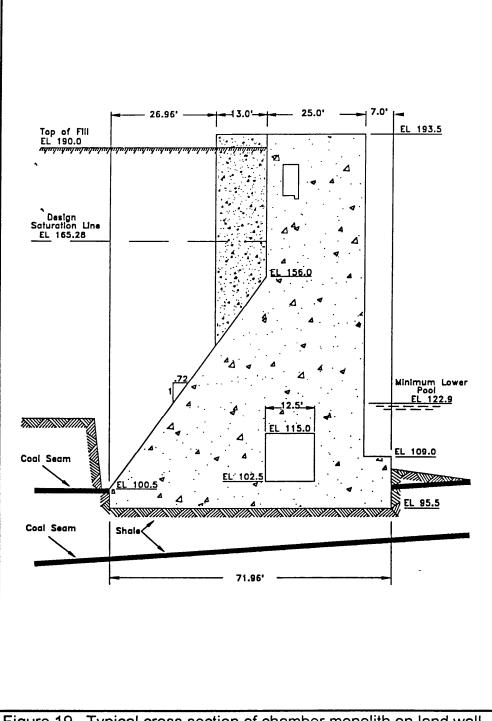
Typical cross section of chamber monolith on land wall at Holt Lock
